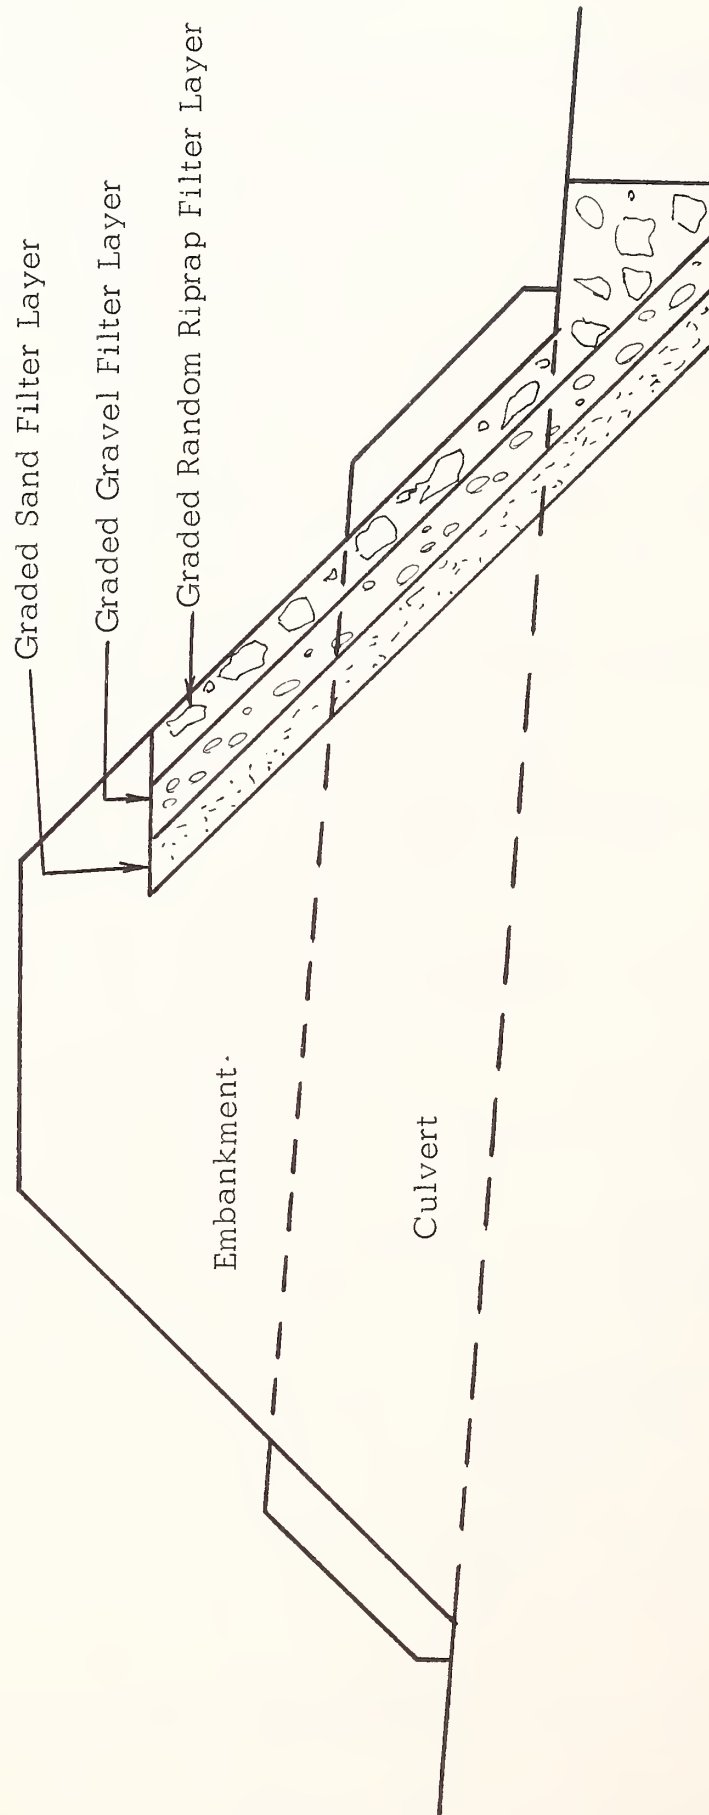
A HYPOTHETICAL CULVERT OUTLET FILTER SYSTEM TO PREVENT PIPING OF A FINE-GRAINED EMBANKMENT SOIL.
